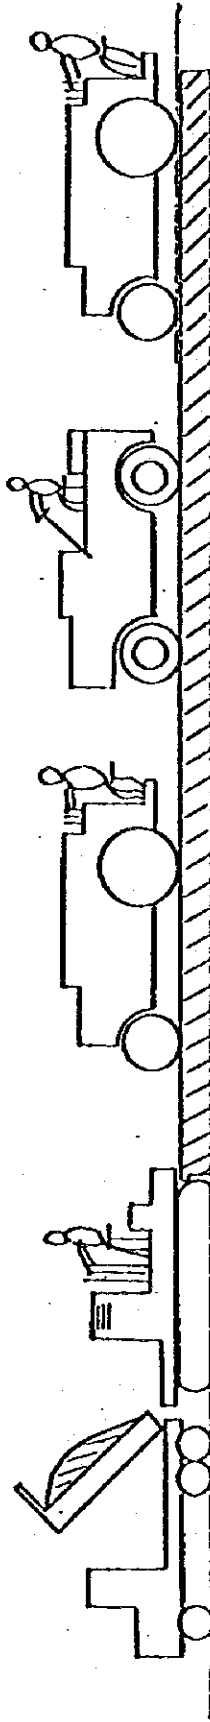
DIAGRAM OF ASPHALTIC CONCRETE WORK
